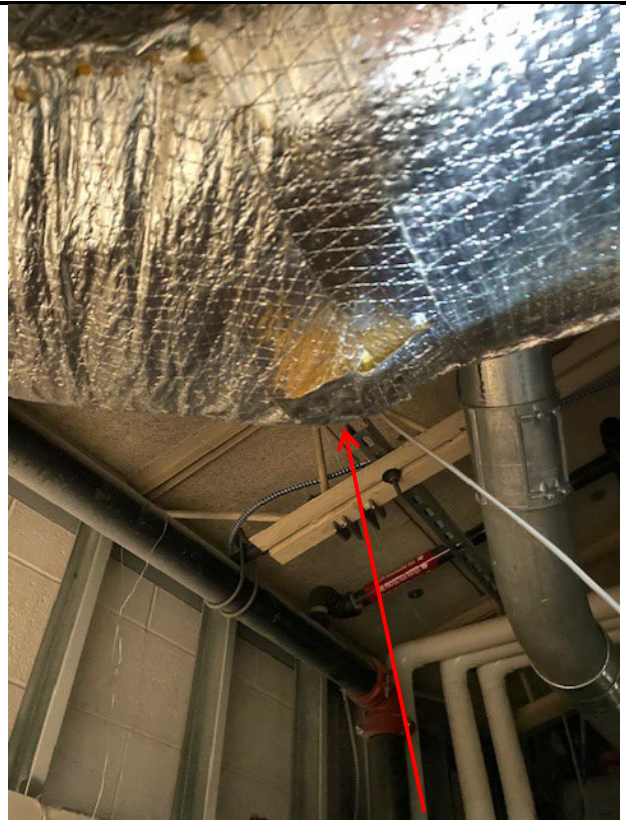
Room C119 - View of ceiling plenum with loose/torn fiberglass duct insulation allowing for condensation.
